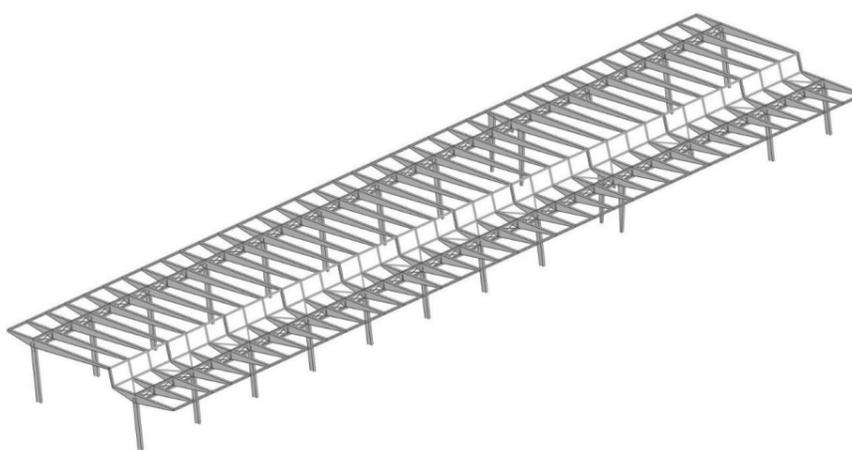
Structural framing of the new roof (view from the North-West)
